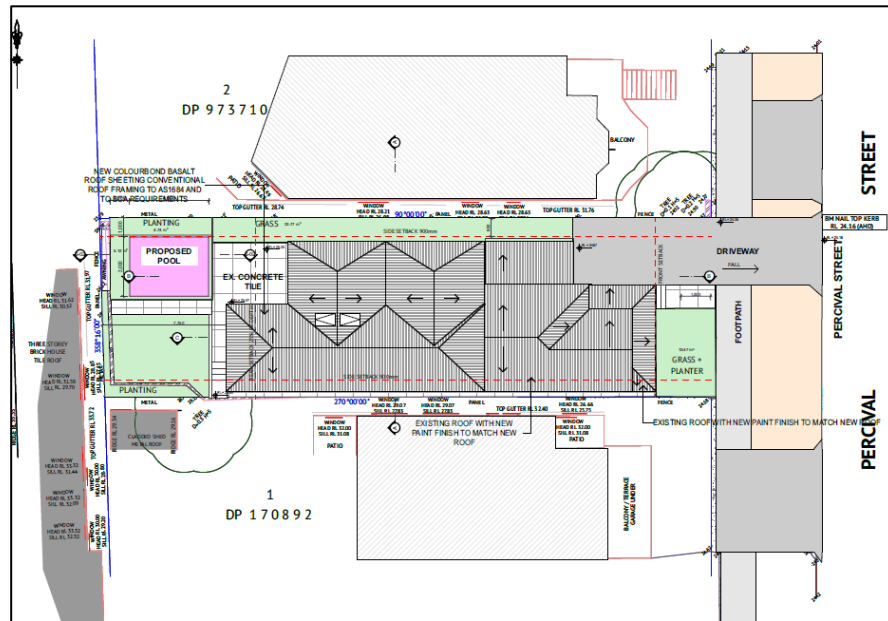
Proposed site plan - 18 Percival Street, Maroubra
